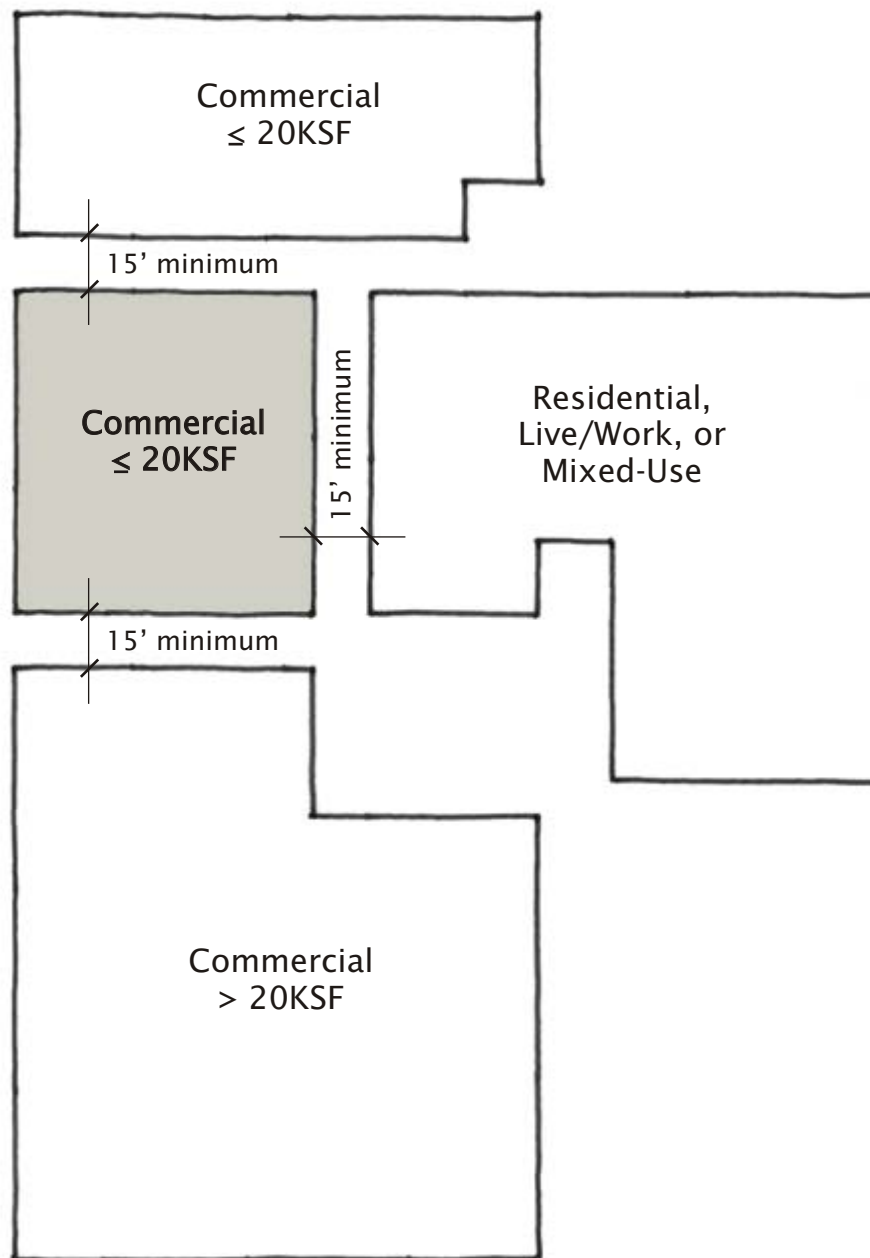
Building Setbacks for Commercial ≤ 20 KSF
